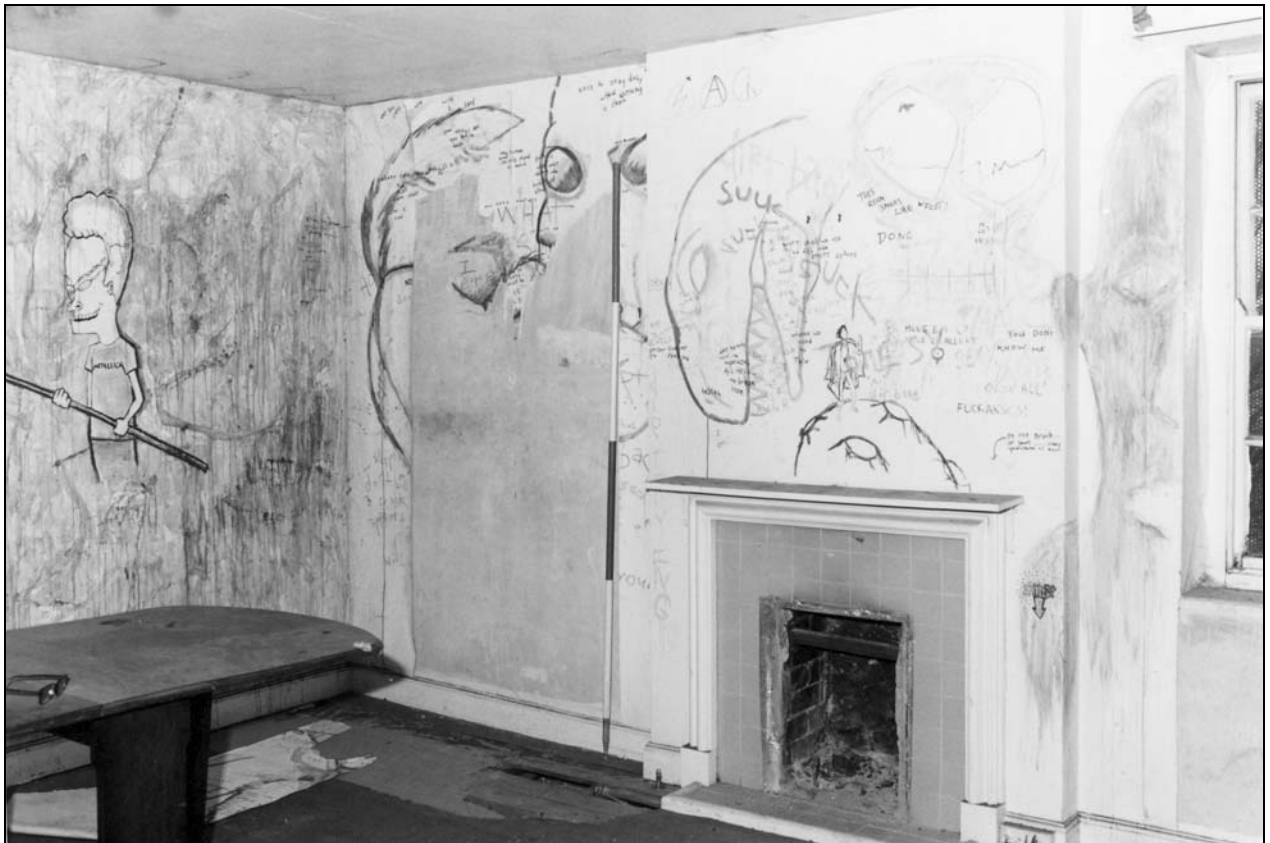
South wing: west second floor room S01, from the north-east (film 6, frame 7)
